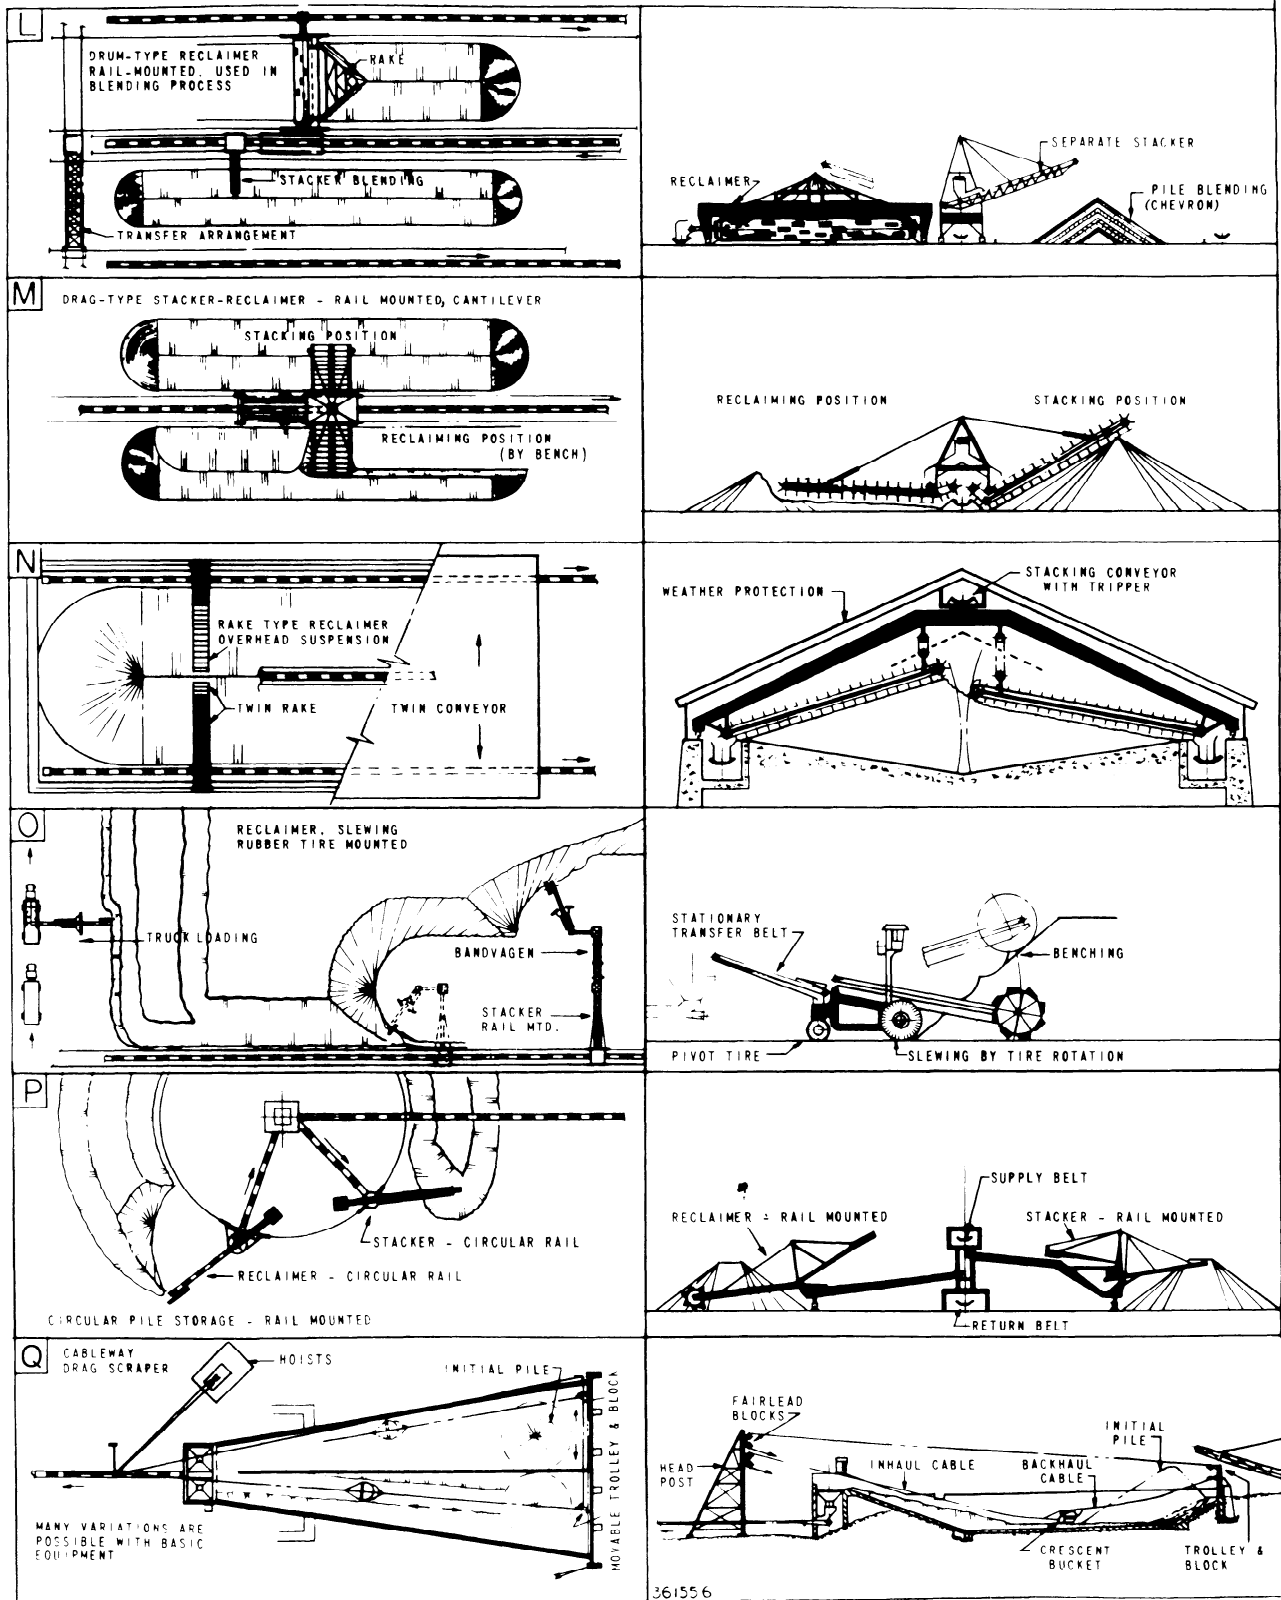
Open storage system layouts. L. Blending drum type reclaimer, rail mounted. M. Drag type stacker/reclaimer with common belt. N. Covered rag type twin reclaimer with separate stacking belt. O. Rubber tire mounted reclaimer-developmental. P. Circular pile storage reclaiming-rail mounted. Q. Cableway drag scraper arrangement-low capacity.
